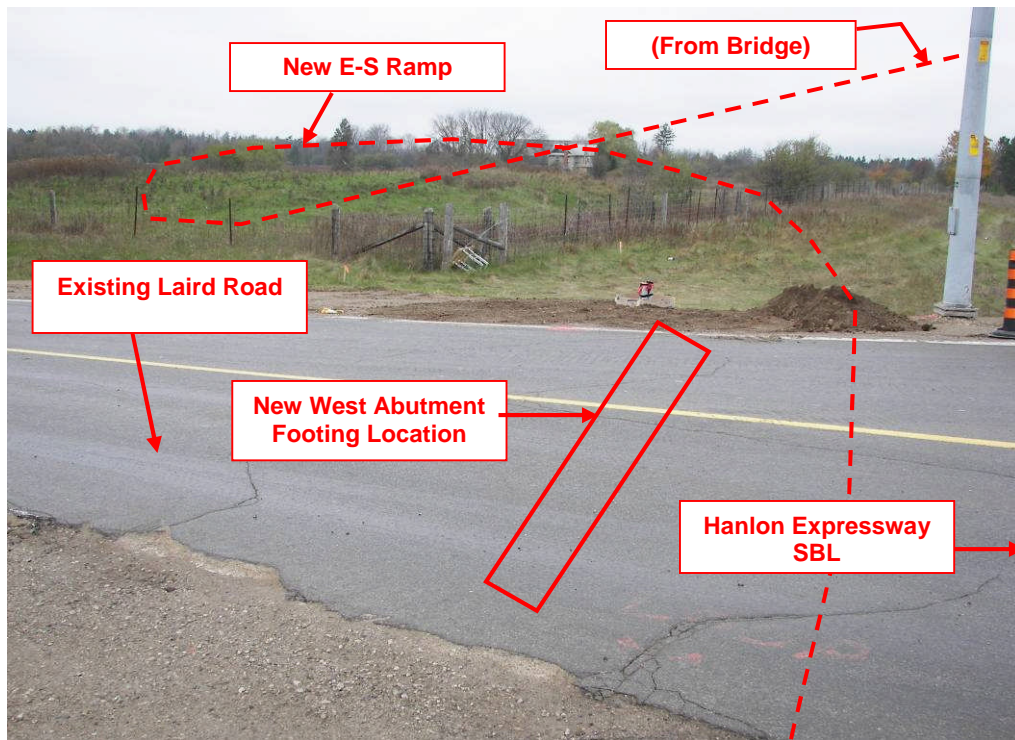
Viewing west from approximately 70 m east of Hanlon Expressway centreline median and north edge of Laird Road toward proposed Laird Road underpass alignment. (Nov. 15, 2007)
